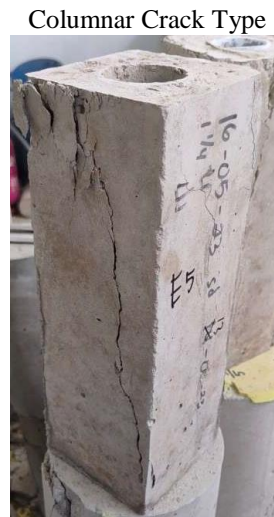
Prism Concrete Without Pipe 1 ½ inch
